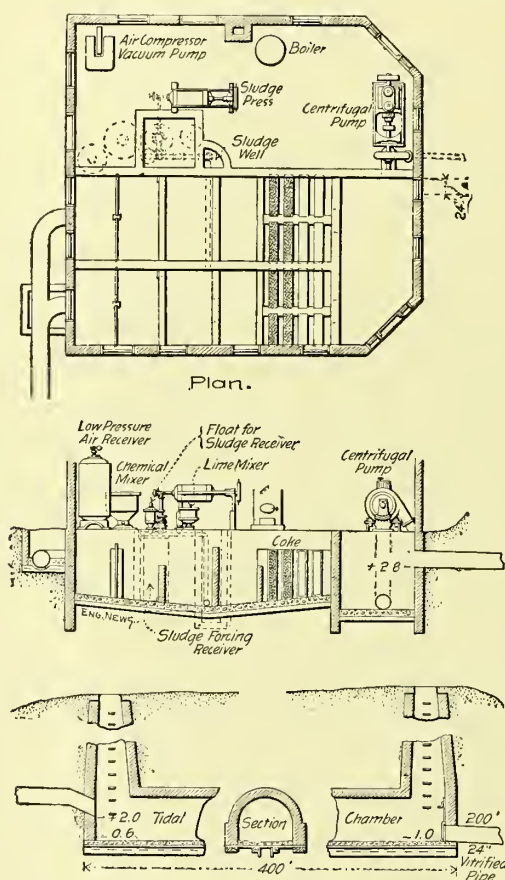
PLAN AND SECTIONS OF PURIFICATION WORKS AT LONG BRANCH, NEW JERSEY, AND SECTIONS THROUGH TIDAL CHAMBER.
